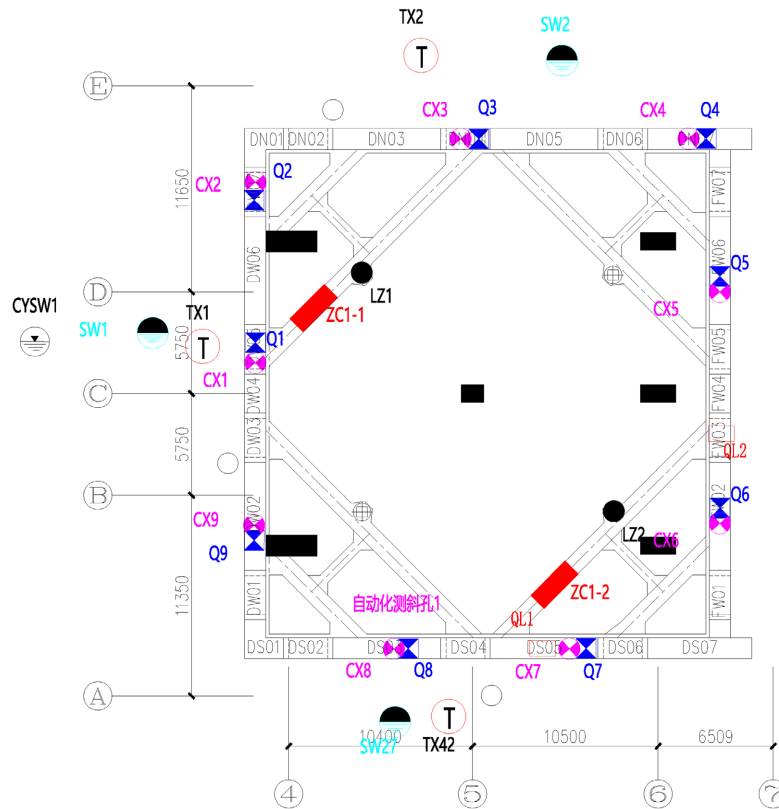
Layout of monitoring points for the retaining structure and support of the foundation pit in zone 4 of Huajing Station
